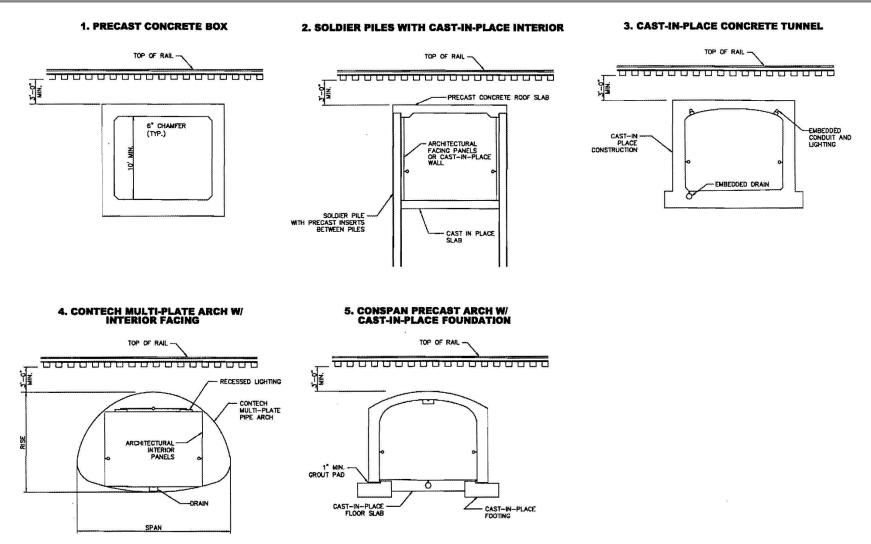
PEDESTRIAN UNDERPASS TYPES
